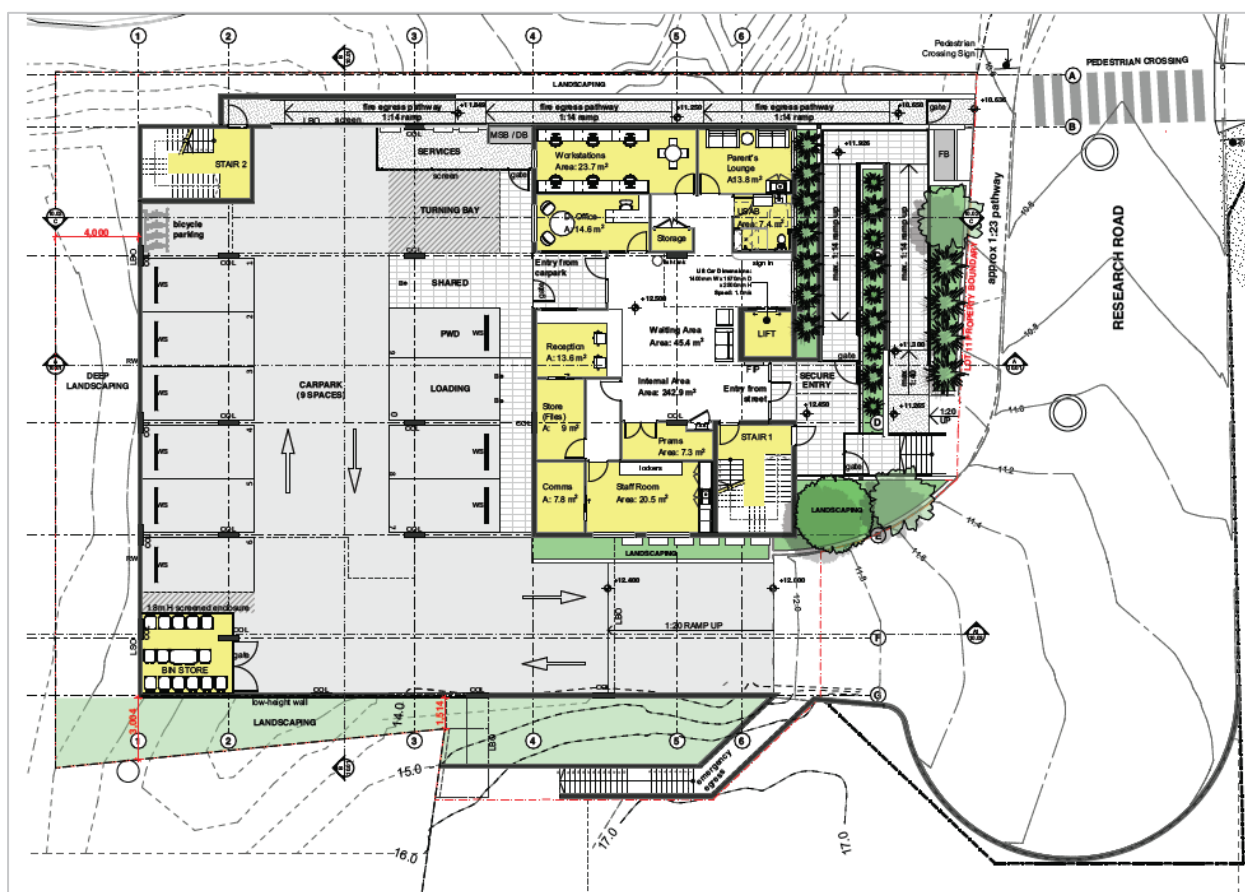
Proposed Childcare Centre Ground Level Plan
